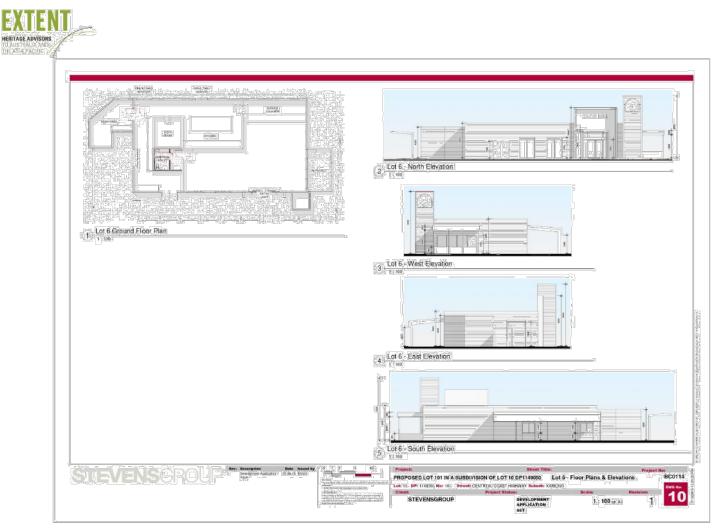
Floor Plan and elevations of the Taco Bell restaurant (source: Stevens Group; Project No. BC0114; Drawing No.04)
